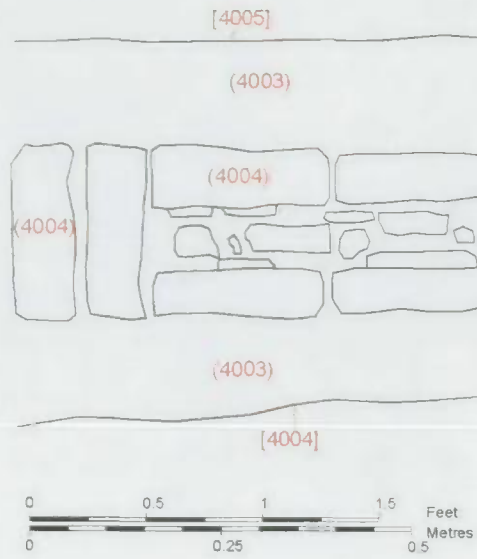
Plan of culvert [4004]. (Scale 1:10).
